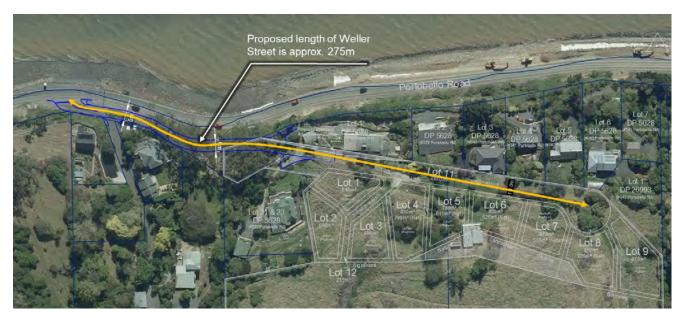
Schematic diagram of the Portobello Road / Weller Street intersection and Weller Street road alignment
